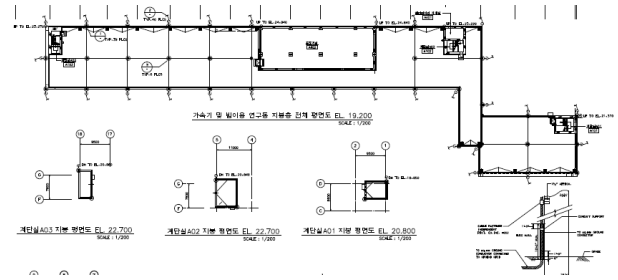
Lightning Protection System of Accelerator & Beam Application Research Building of PEFP.
